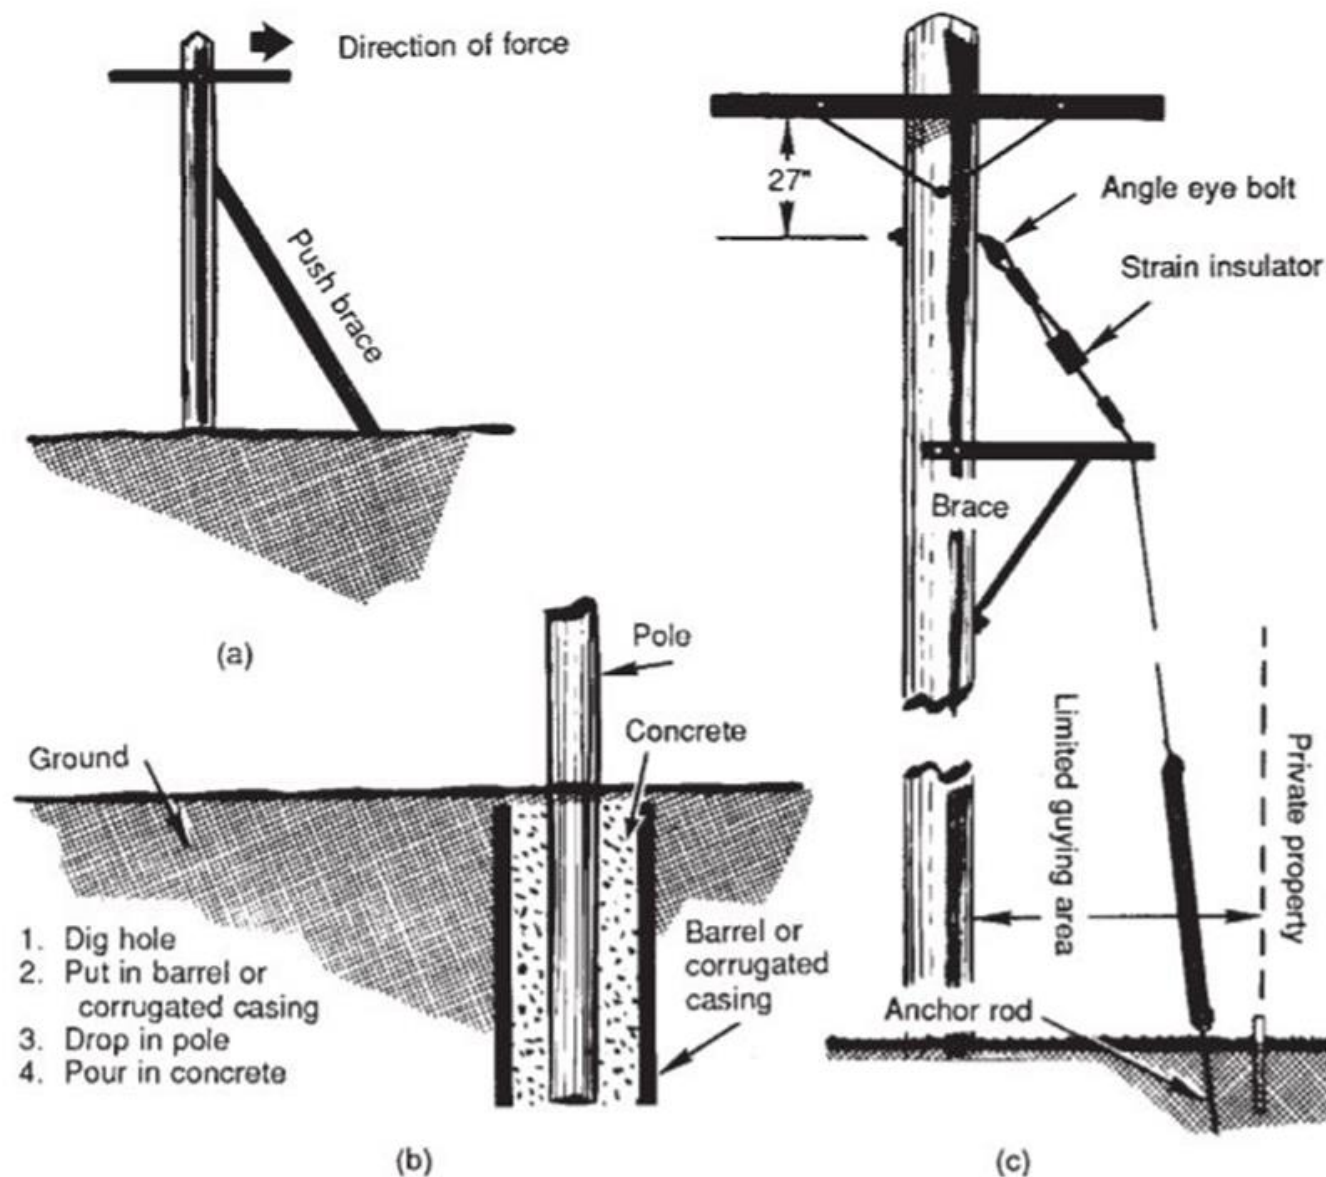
Other methods of sustaining poles. (a) Push brace, (b) concrete-filled barrel, and (c) braced anchor buy.
